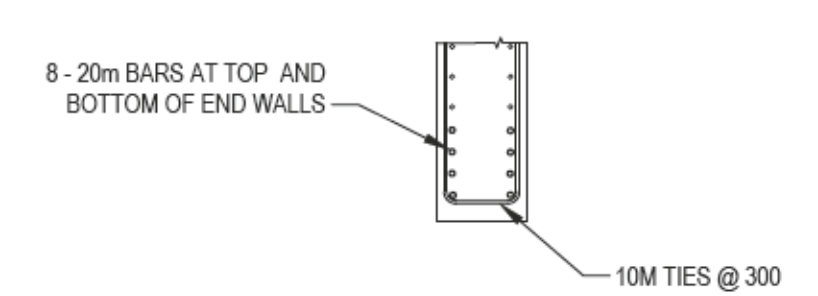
SCALE 1:25 LONGITUDINAL WALLS
